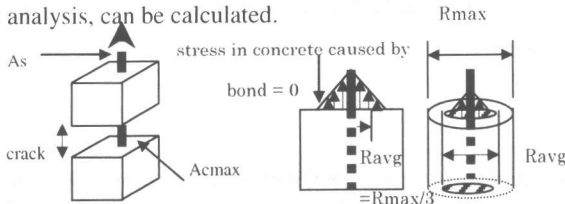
Sudden yielding of reinforcing bar on crack plane
